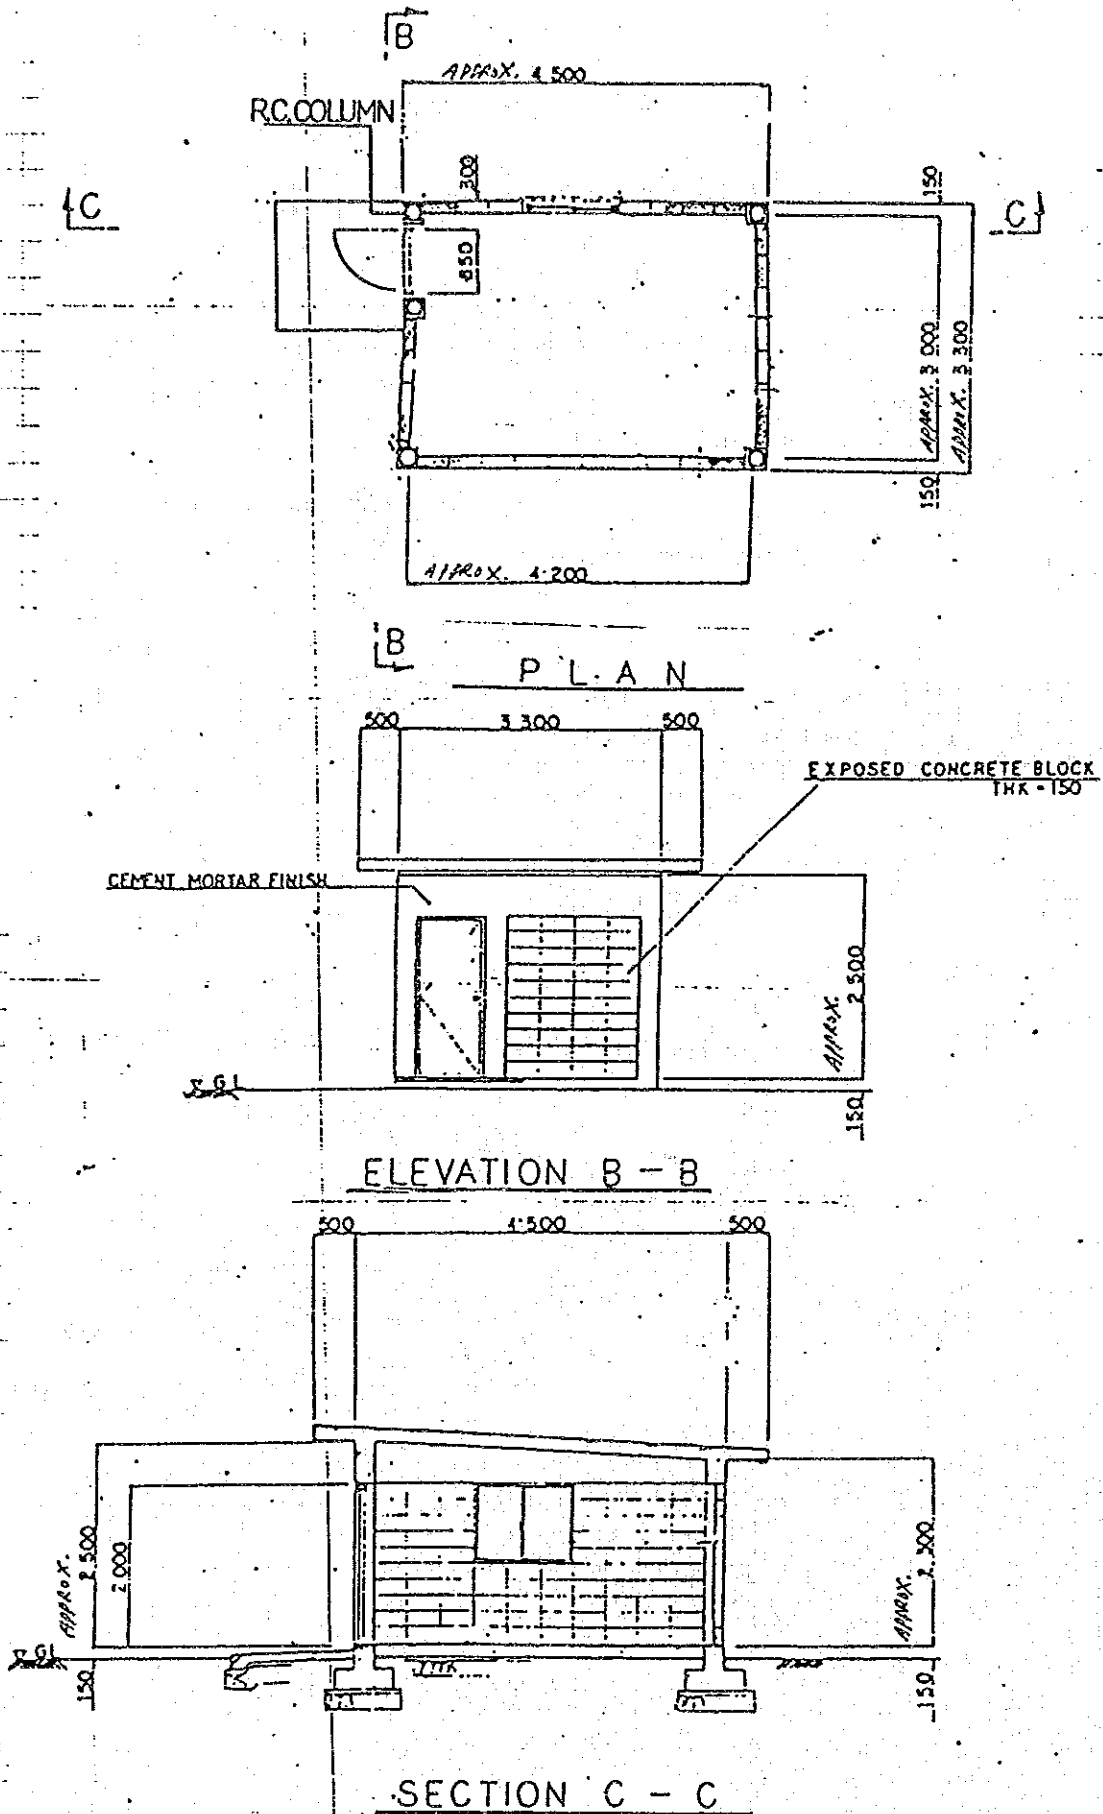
VALVE HOUSE FOR STEEL WATER TANKS
